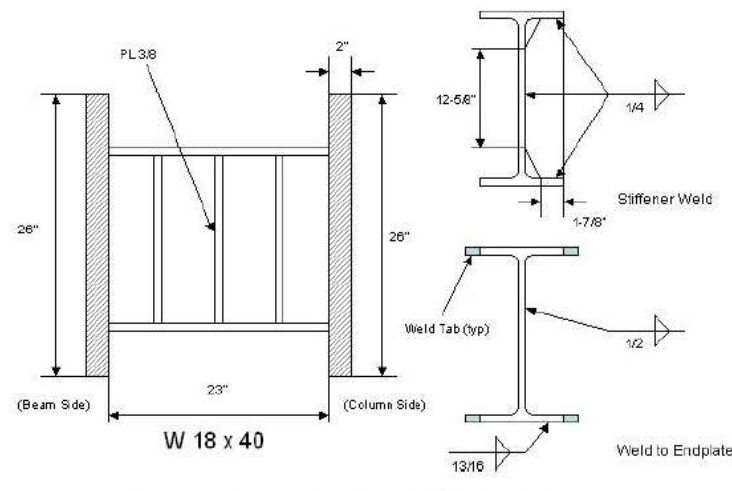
Shear link assembly 12 (Ryu, 2005)
